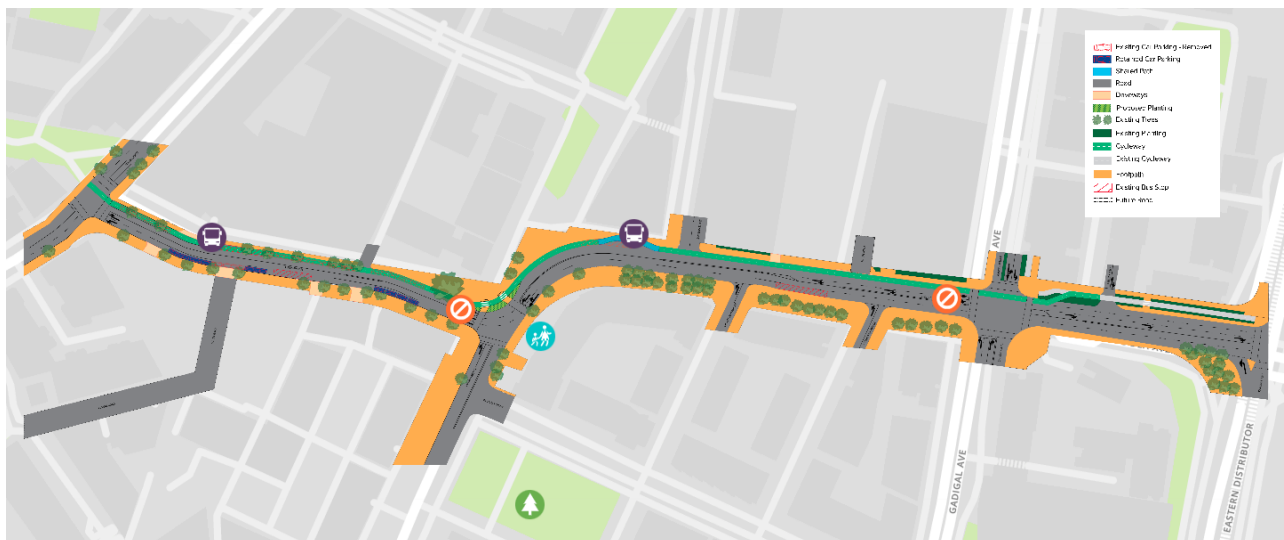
The proposed O'Dea Avenue cycleway from Bourke Street to South Dowling Street (Source: City of Sydney Council)
